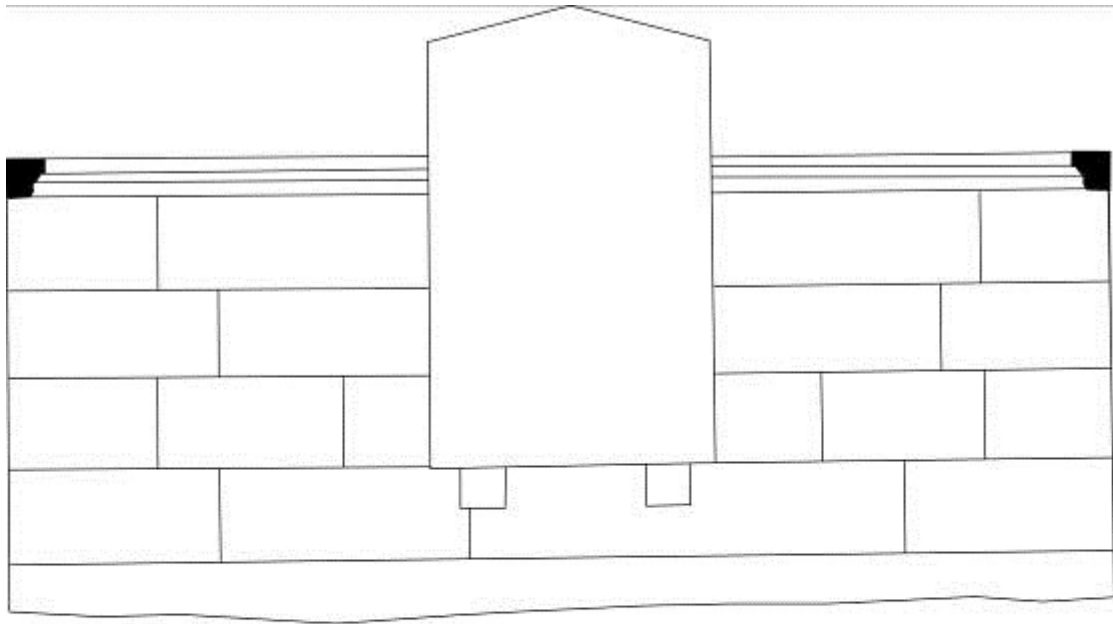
Drawing of south facing elevation of burial enclosure Scale 1:40
